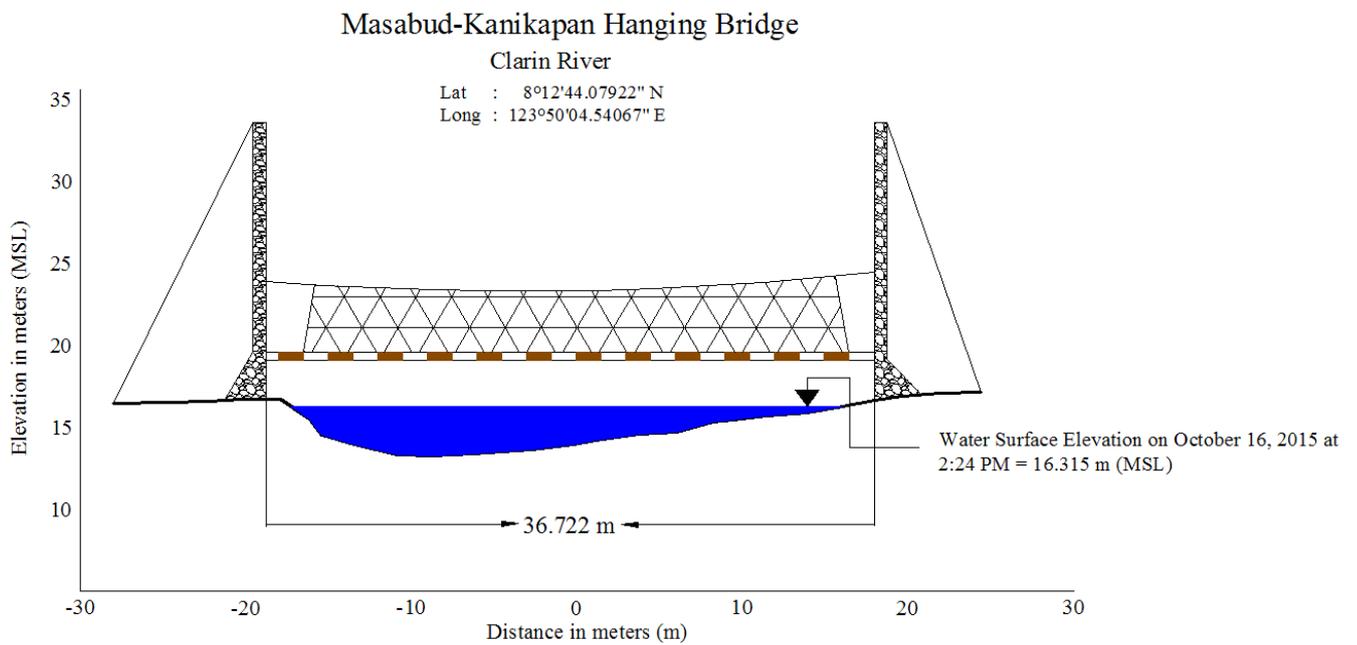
Masabud-Canicapan Hanging Bridge cross-section survey drawn to scale.
